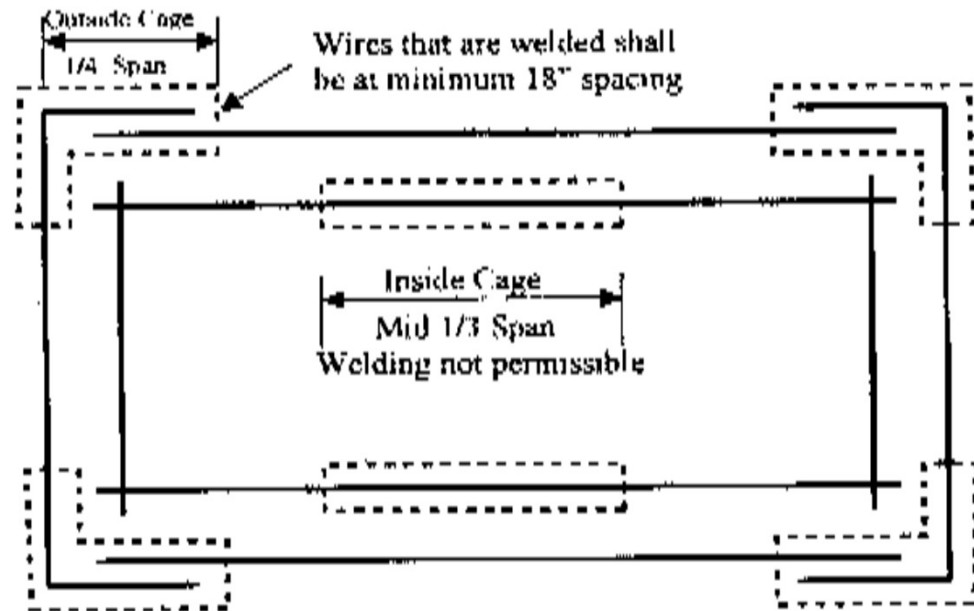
Critical Zones of High Stress Where Welding is Restricted
